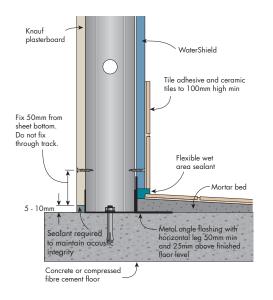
Wall Base in Wet Areas (Outside Shower) With flashing angle
